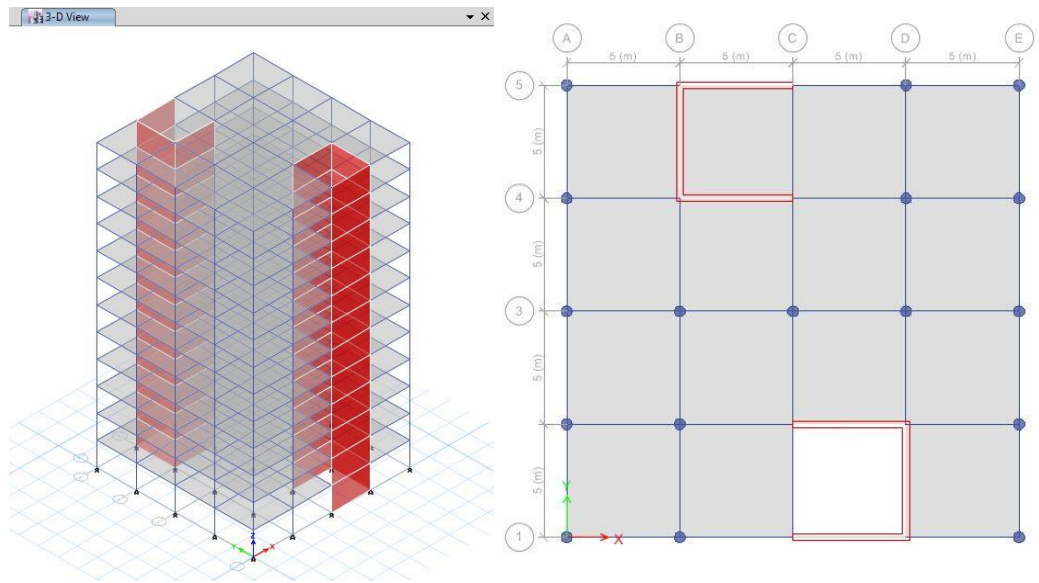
(3-D VIEW OF G+11 BUILDING & PLAN OF BUILDING WITH CIRCULAR COLUMNS)
